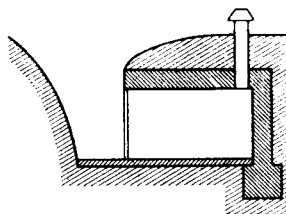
Heavy underground building for manufacture of nitroglycerine.
